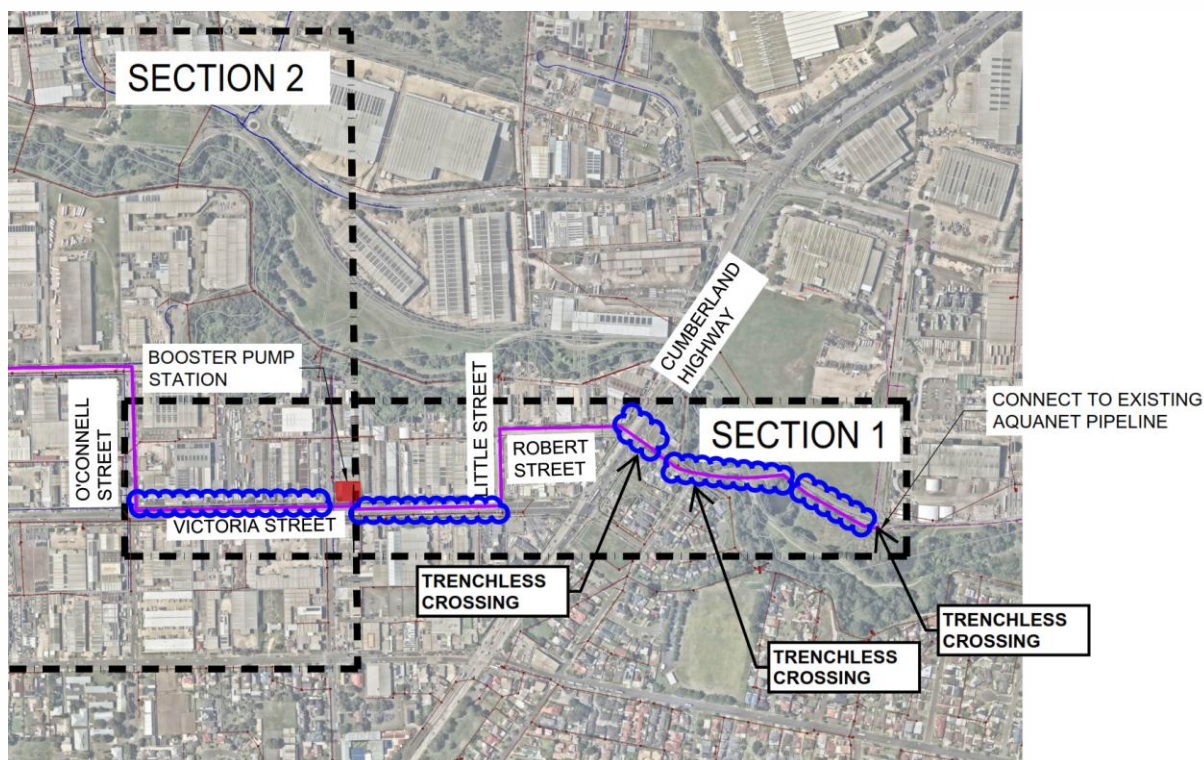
Detail of eastern part of the Project Area (purple) showing proposed trenchless crossing locations (blue). (Source: Provided by client)
